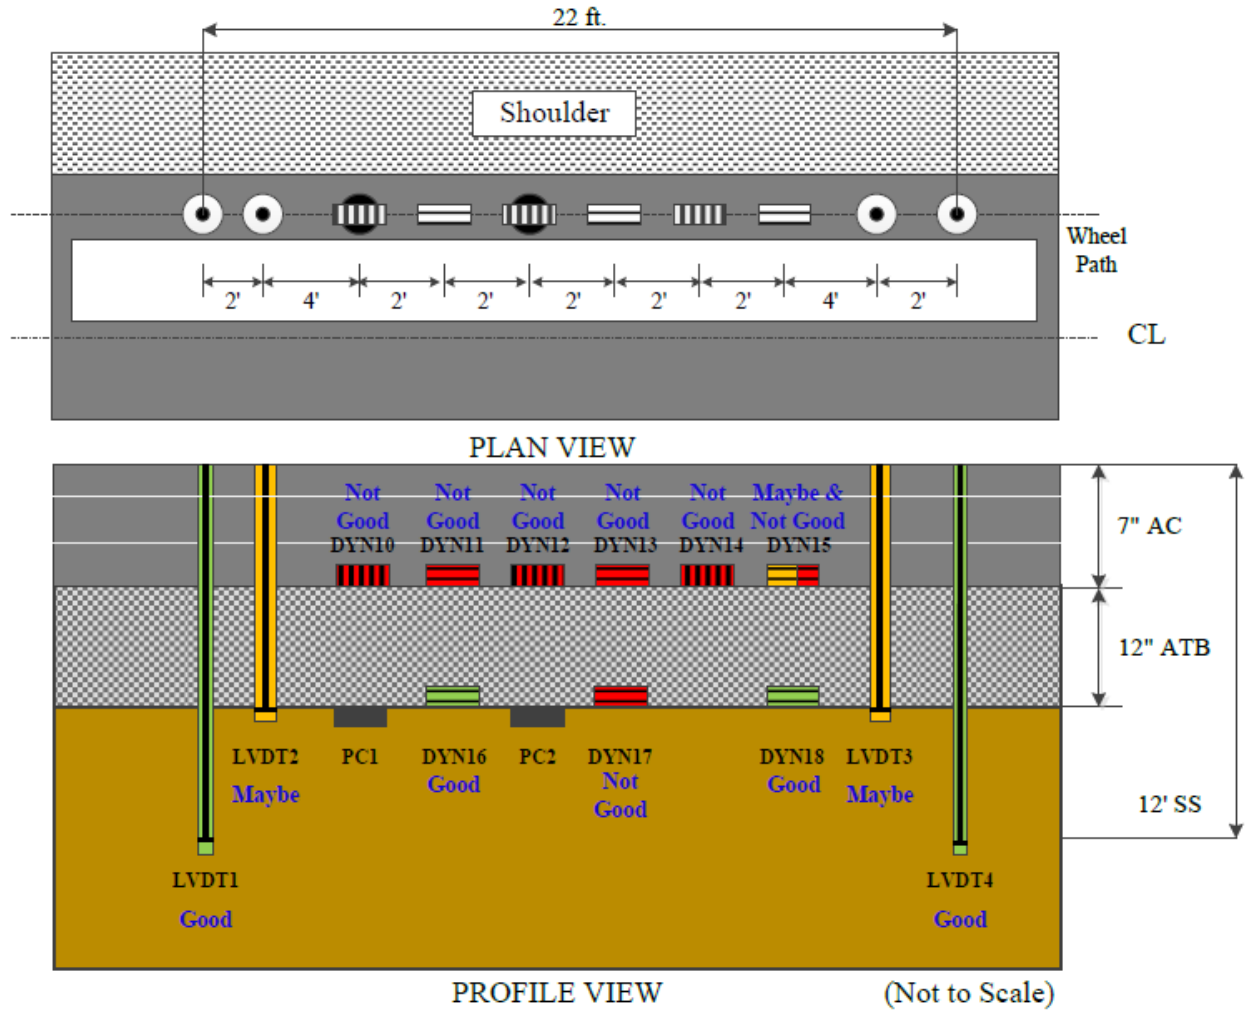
Illustration. QC results by sensor type for test section 390104 test J4G.
